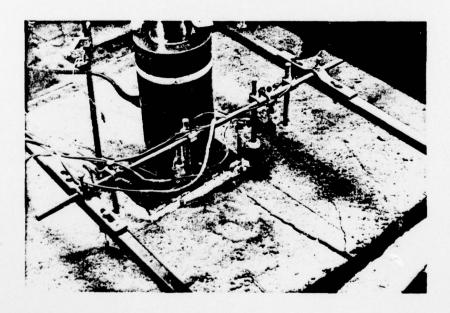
CRACKING ON TOP OF SLAB 2
